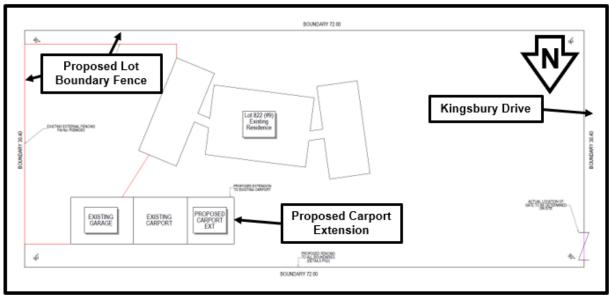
Site plan depicting proposed carport extension and lot boundary fence to all boundaries
